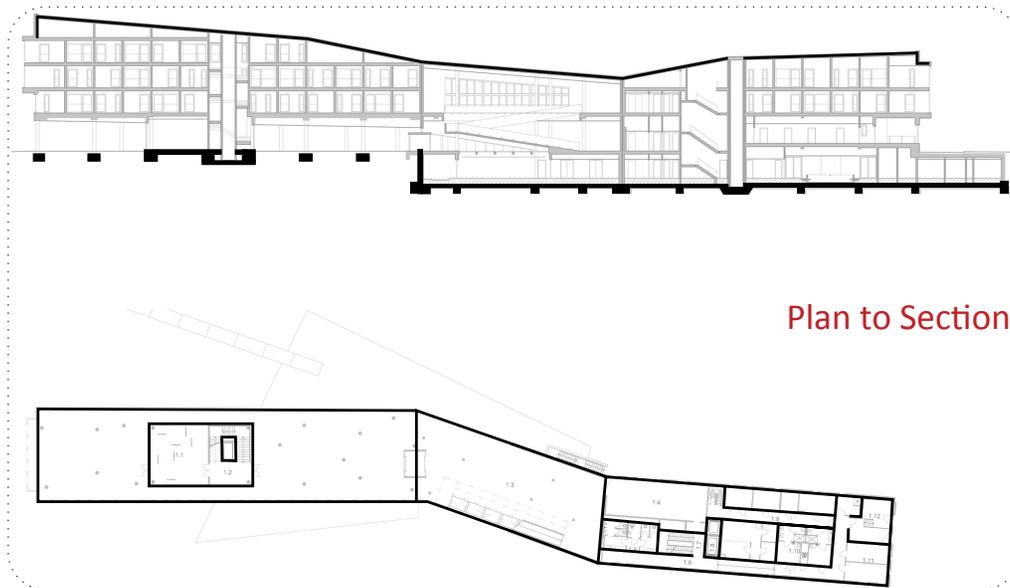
Plan to Section-Miura. Retrieved from: www.archdaily.com
